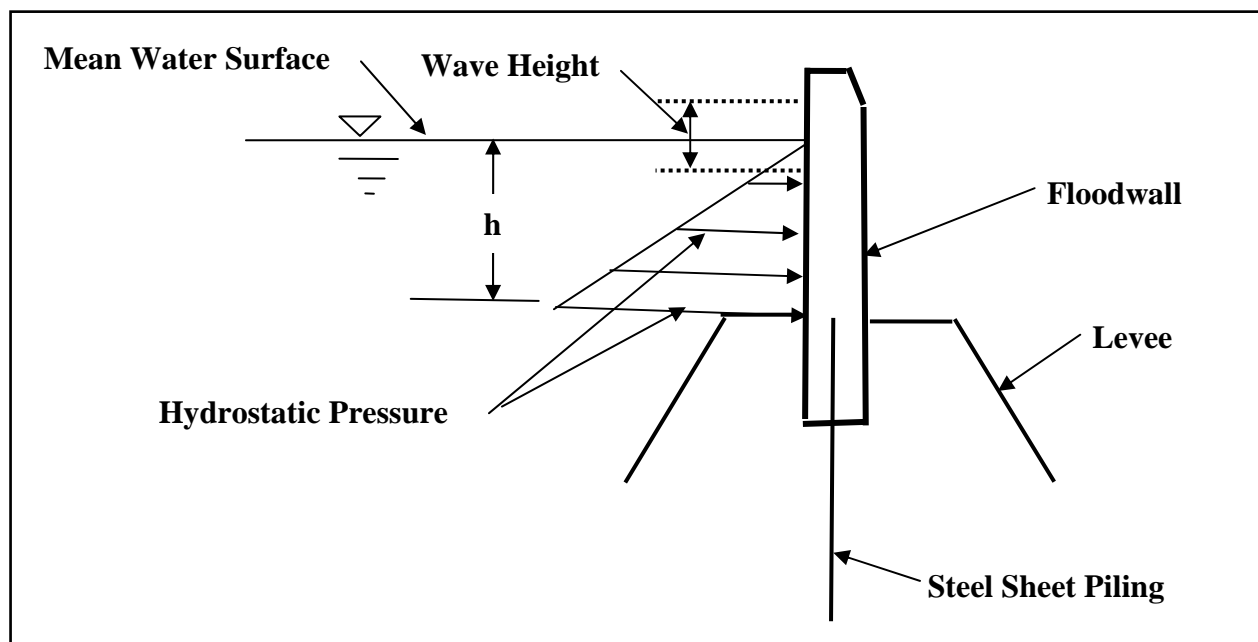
Definition Sketch of Hydrostatic Forces Acting on a Floodwall and the Wave Height Superposed on the Mean Water Surface, assuming wave is traveling along floodwall
